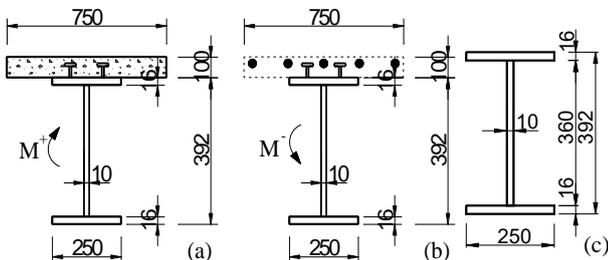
Cross section of combined beams and steel columns (a - cross section at the span; b - cross section at the pillow; c - cross section)
